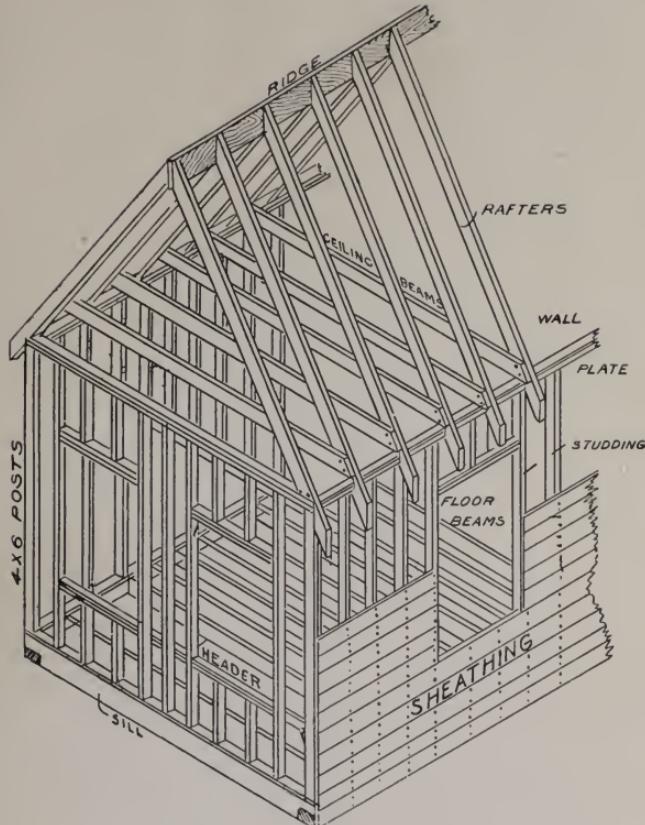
Illustrates the frame of a small framed cottage, of one story, with the ceiling beams and rafters raised, and one side partly sheeted or rough boarded. Upper headers are doubled in windows.
